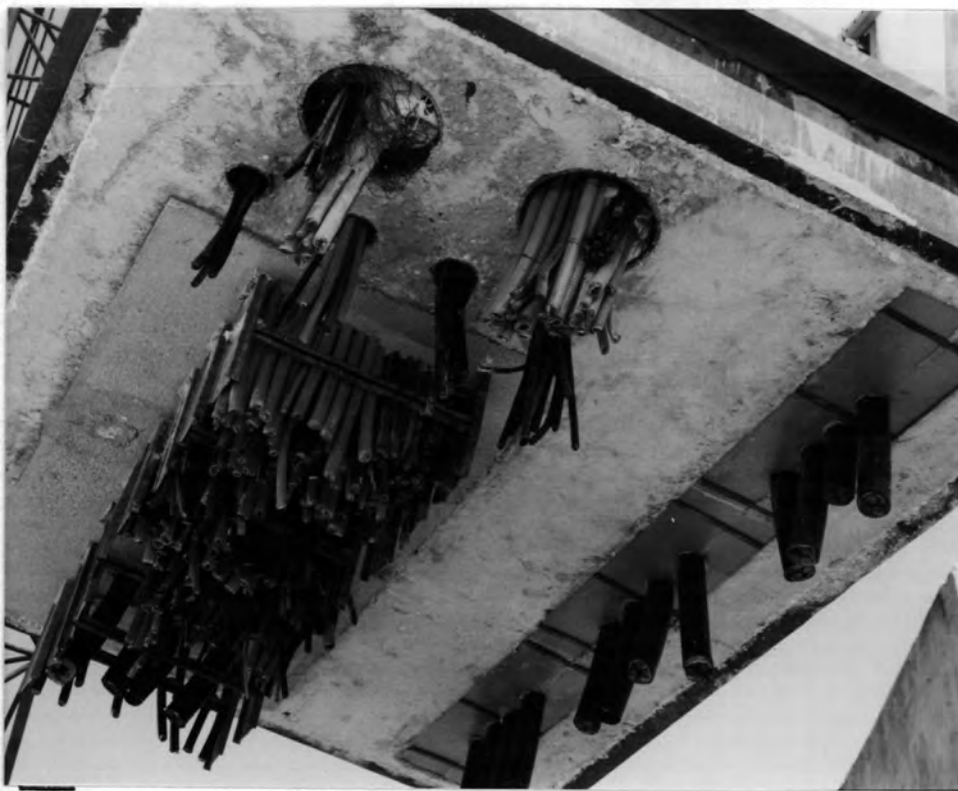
OVERALL VIEW OF TEST SLAB EXPOSED SIDE
